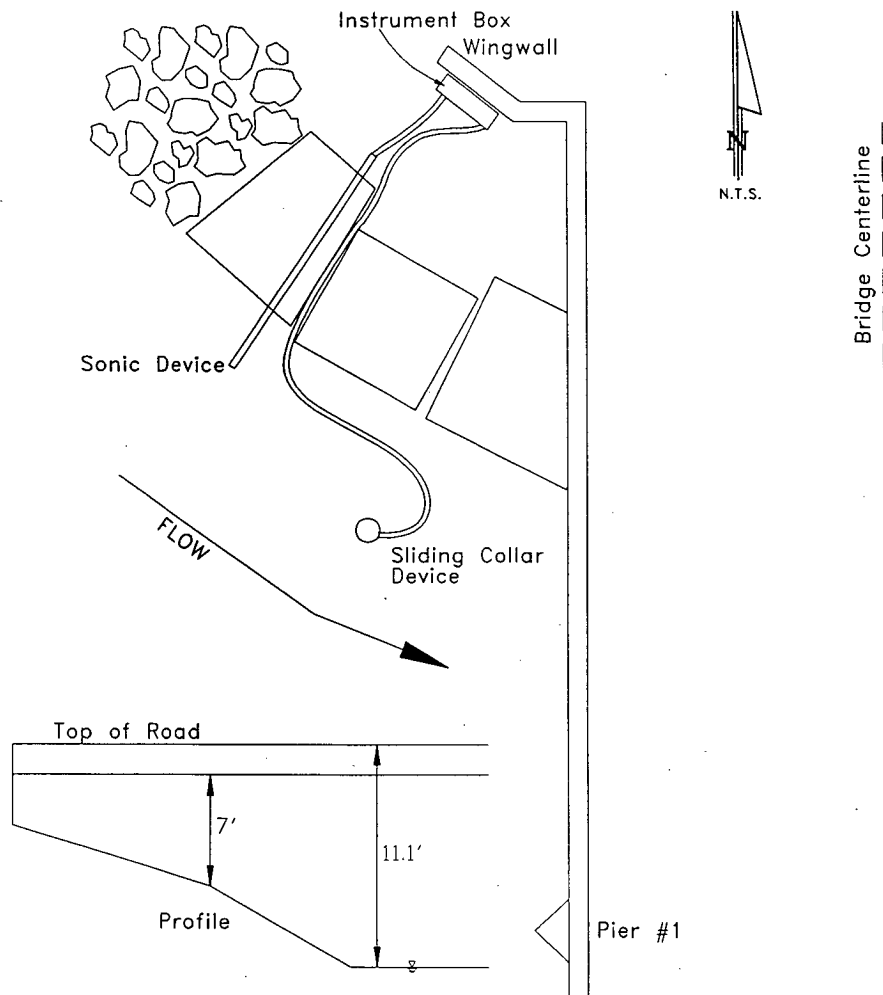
Abutment scour monitors, sonar, and sliding collar at Highway 37 bridge over the South Platte River near Kersey, CO (Site CO2).
